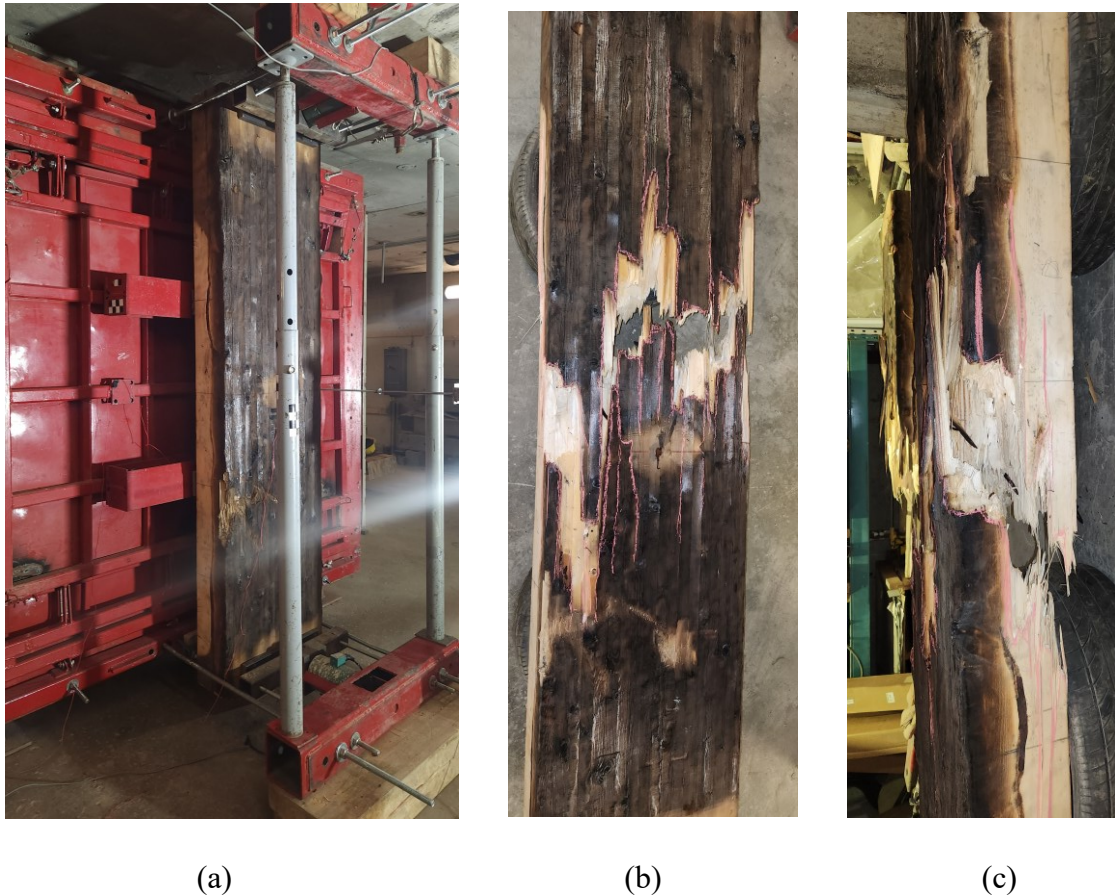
Dynamic Failure of CGLT6 [215]: (a) Before test; (b) After test - front view; (c) After test - side view
